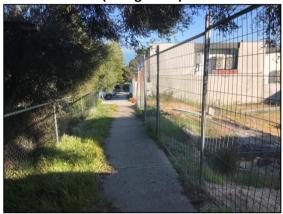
Photo of existing footpath looking west from 20 Deane Street
